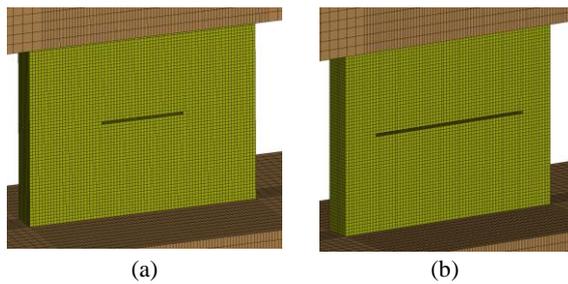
Concrete voids in shear wall model for (a) 20%, (b) 40% of shear area.
